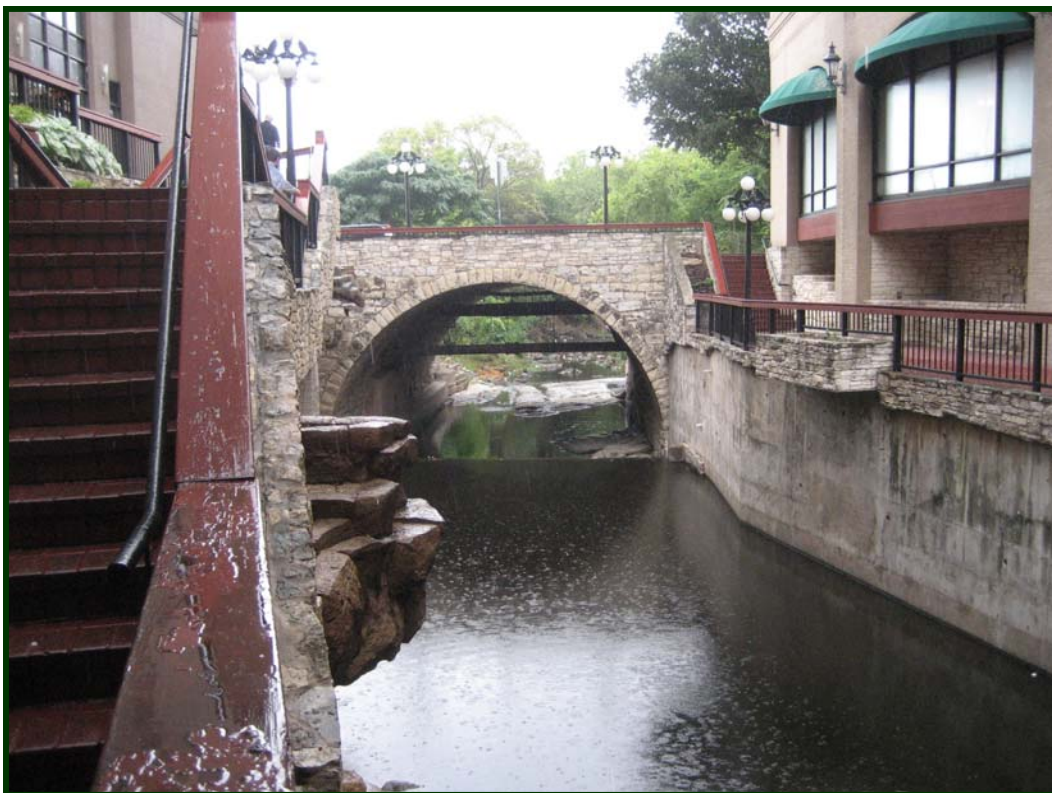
~ 5TH STREET BRIDGE, LOOKING DOWNSTREAM
